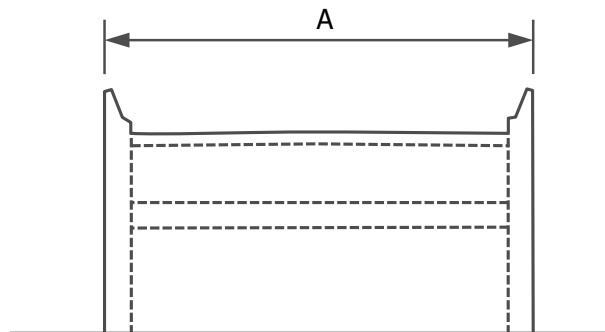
Cross-section view of a filled arch bridge or culvert under fill with headwalls.
